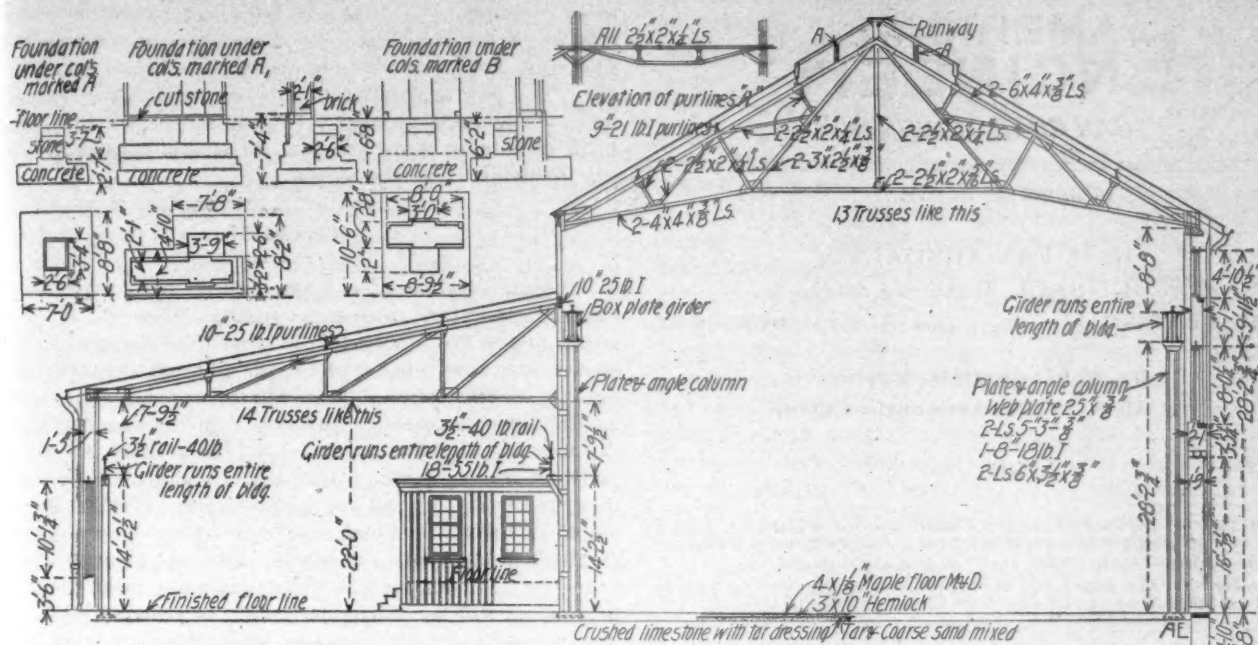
Boiler Shop—Section of Roof and Crane Columns Showing Foundations which are Located in Fig. 4.
